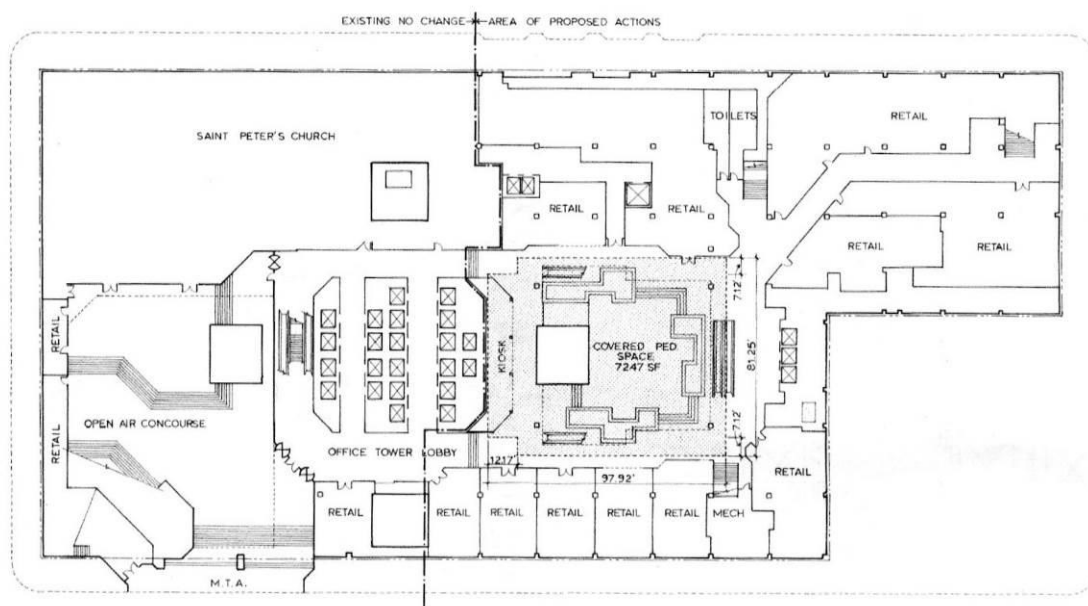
Floor Plan and Views of CitiCorp Atrium before Redesign
